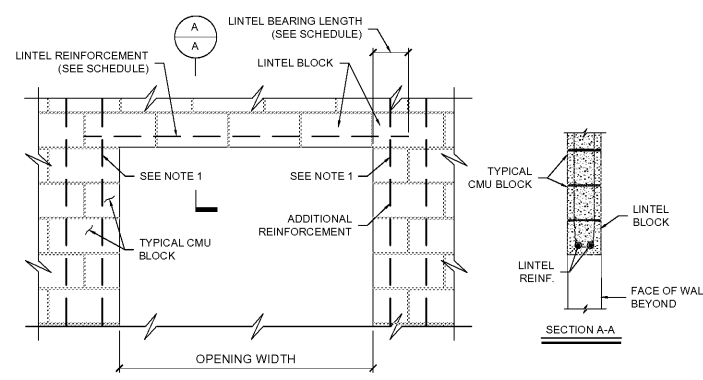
DETAIL OF TYPICAL REINFORCED CMU WALL CONSTRUCTION 1
